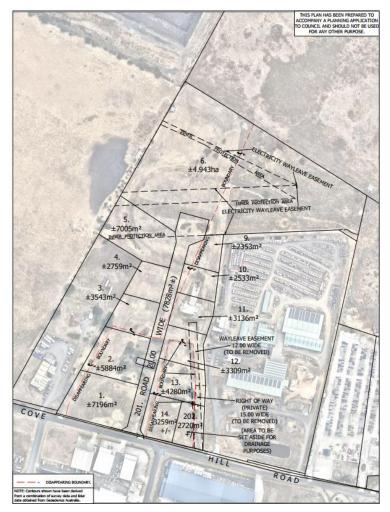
Proposed subdivision layout. Refer to Annexure 2 for detail.
